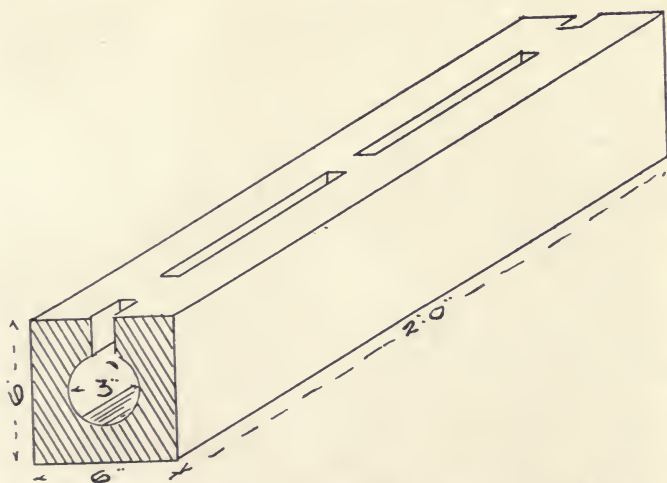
Concrete pavement gutter in the Borough of Aylesbury.
